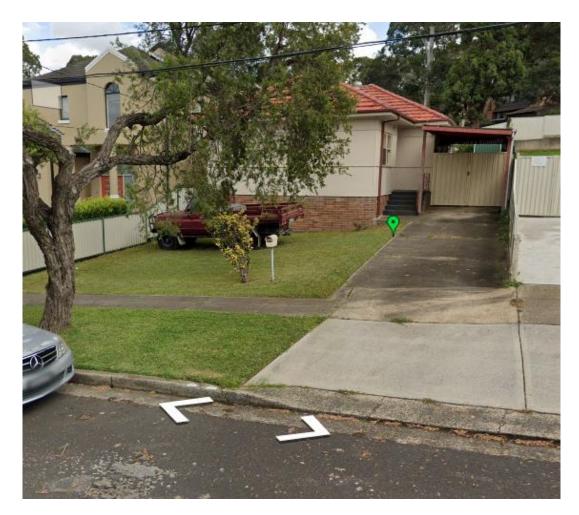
THE SUBJECT SITE VIEWED FROM THE STREET
